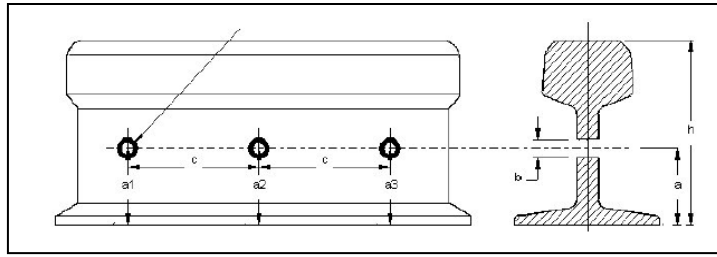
Drilling of holes for mounting of TX & RX coils
